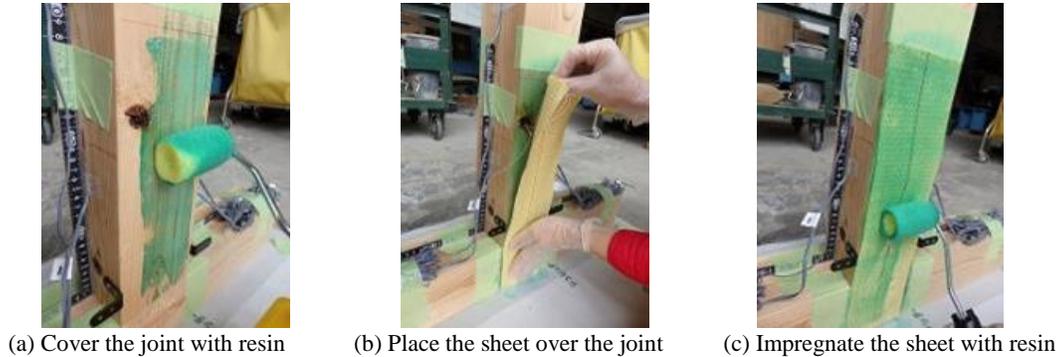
Method of attaching the aramid fiber sheet to the joints of the specimens.
